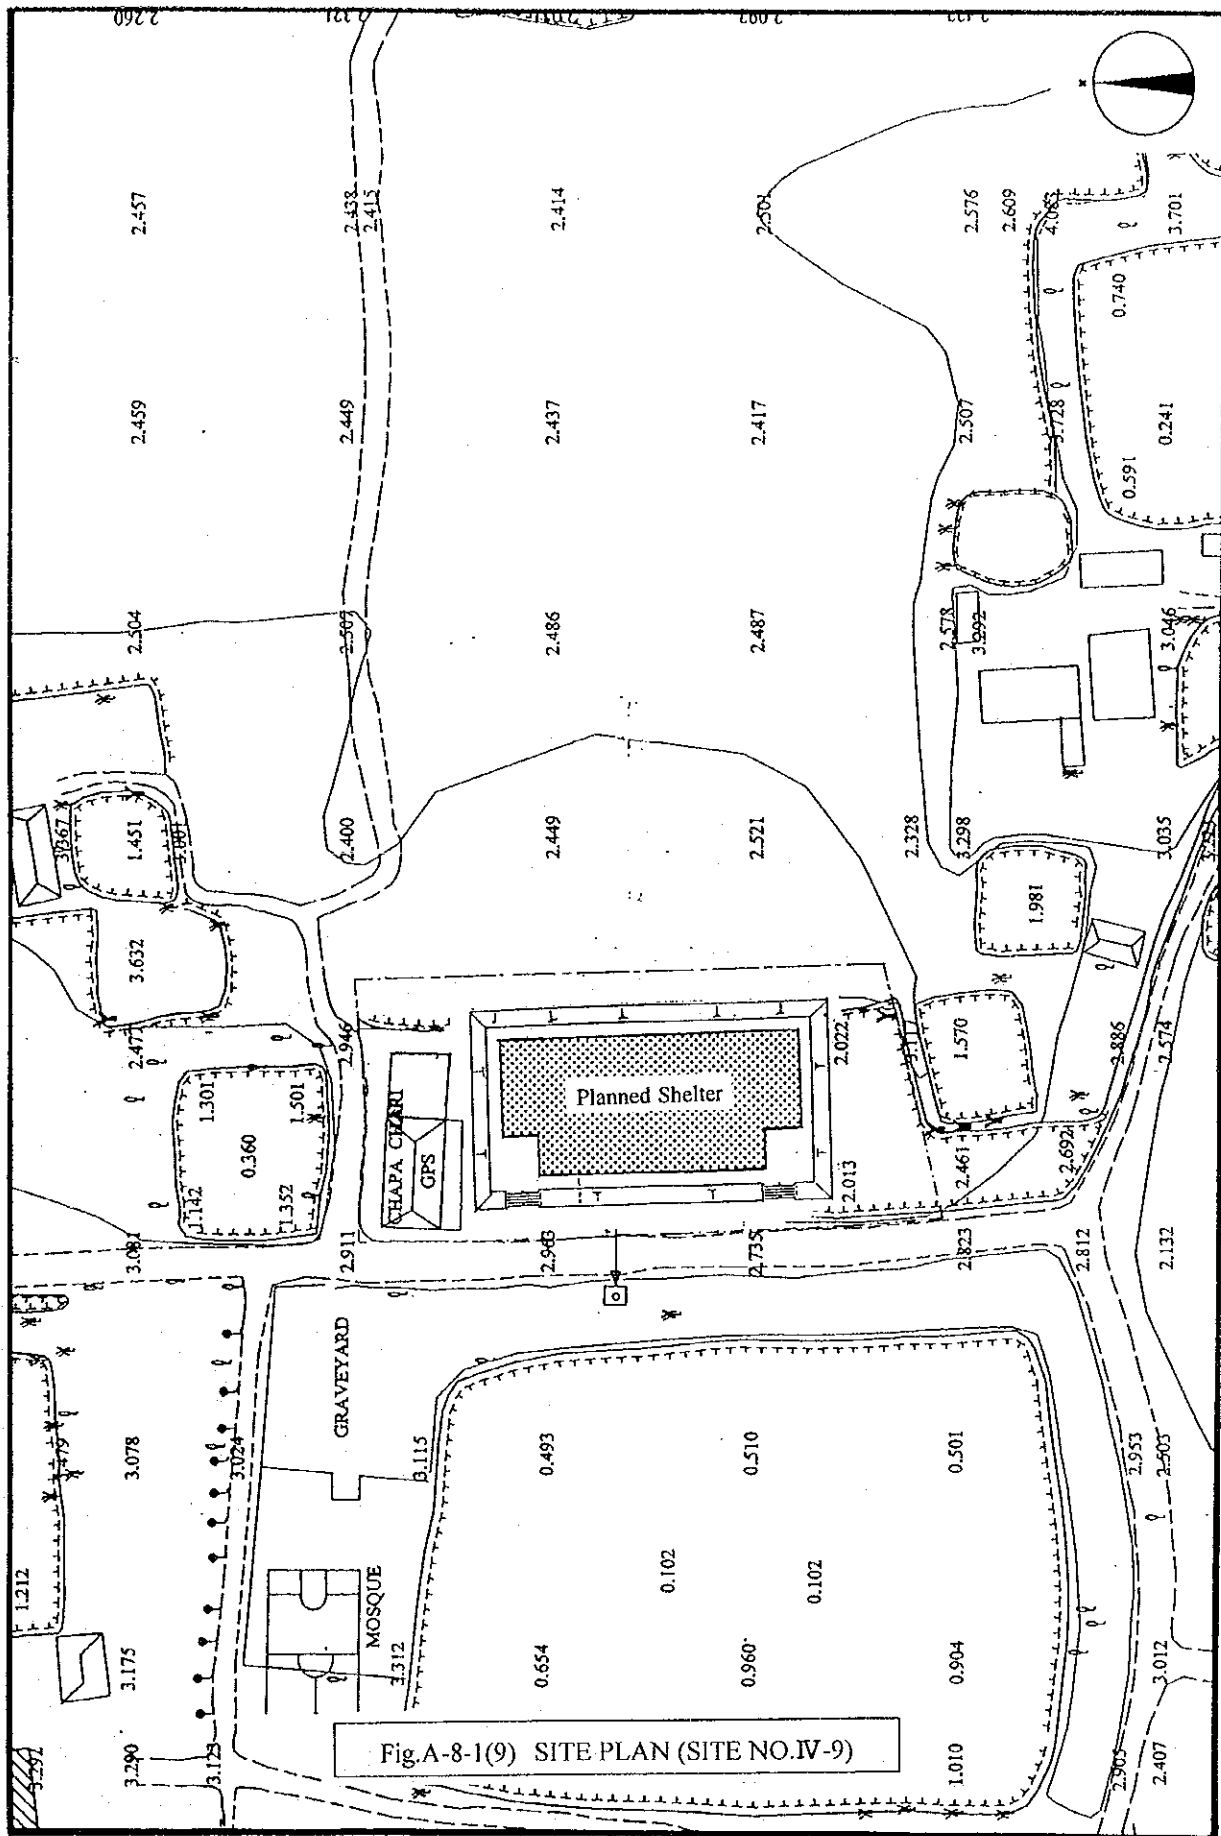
(9) SITE PLAN (SITE NO. IV-9)
